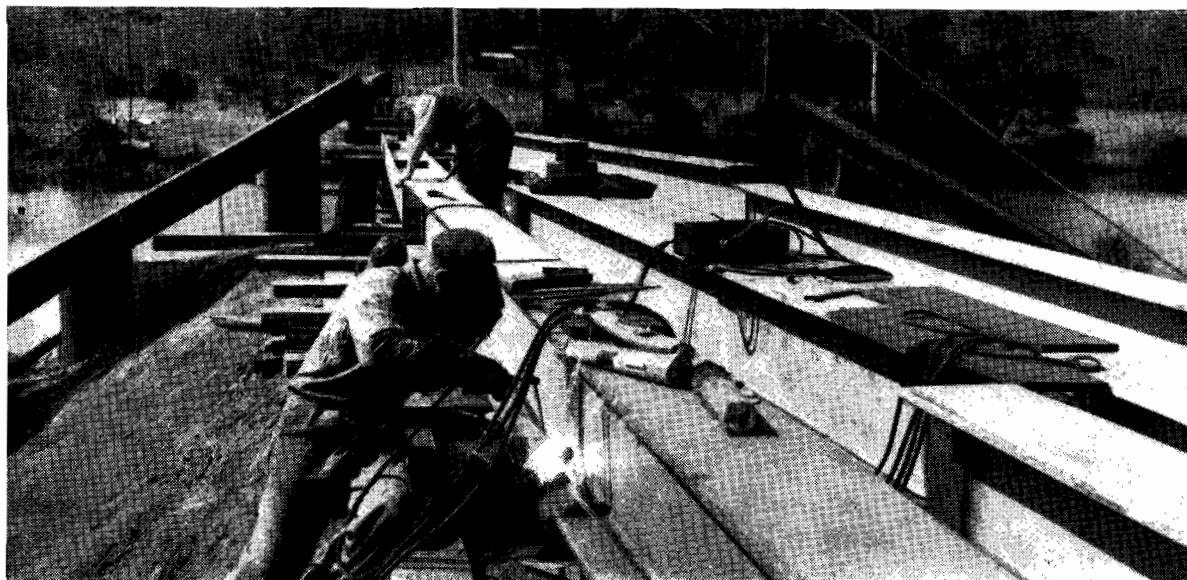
Work in progress on bridge over the Wallagaraugh River in East Gippsland.
